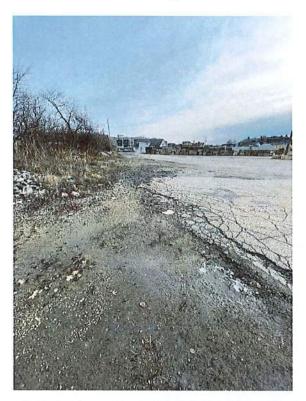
Edge of concrete block wall at 90 Maplewood Ave LLC lot (right) looking northeast over existing pipe. Taken 1/19/23
